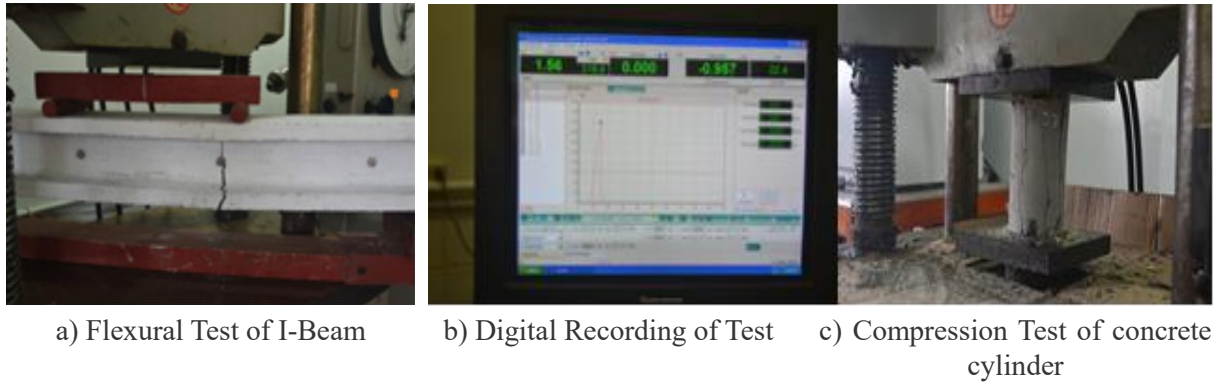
Routine Testing of I-Beam and Concrete Cylinder
